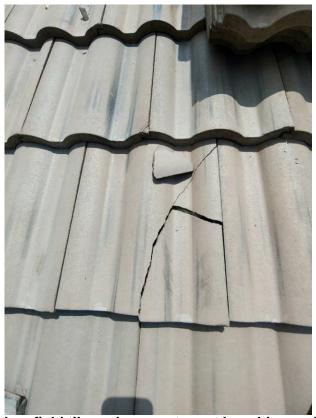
Roof field, ridge and hip tile installations with polyurethane foam adhesive was in progress on building 21741.
